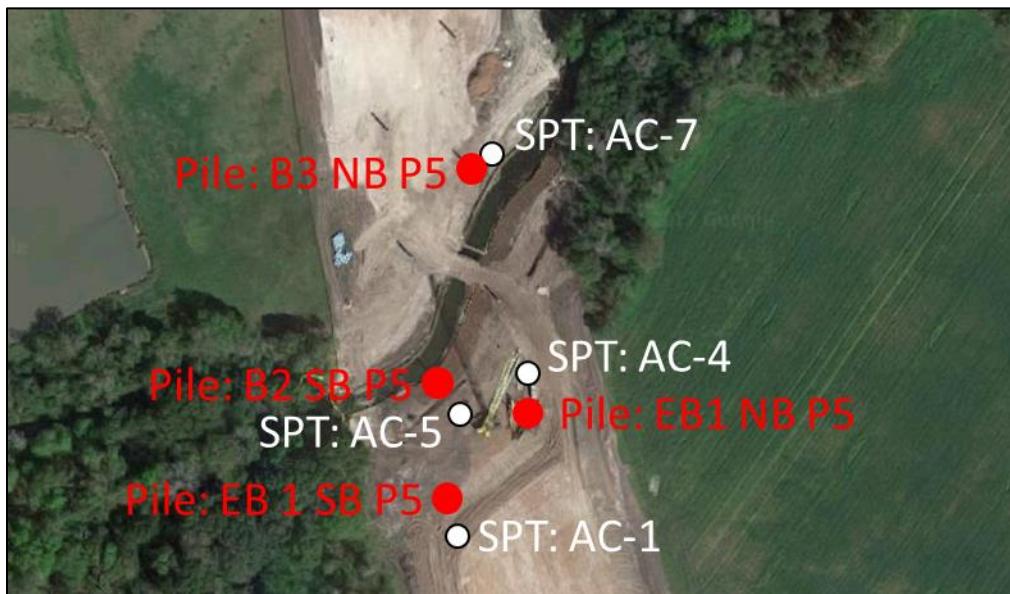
Test pile and SPT boring locations for Starke Bypass over Alligator Creek
